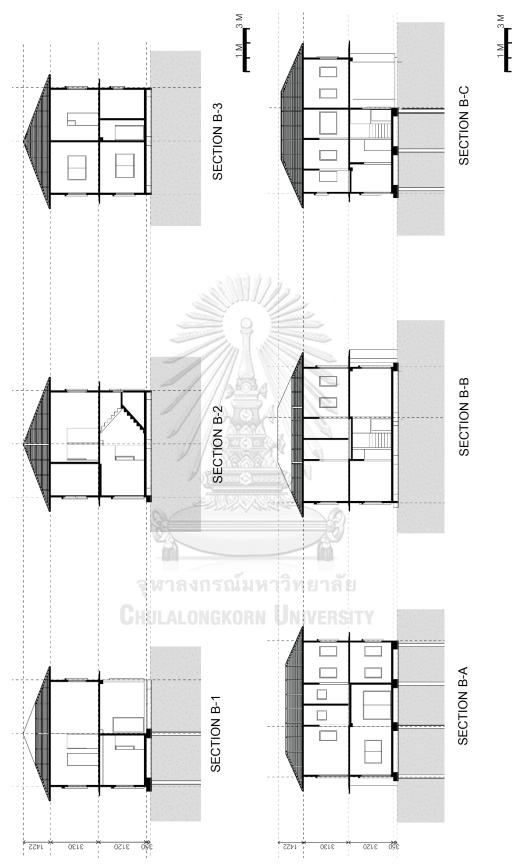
Drawing of front section cut of A2 unit at section B-1, section B-2, section B-3 and a side section cut of A2 unit at section B-A, section B-B, and section B-C.
